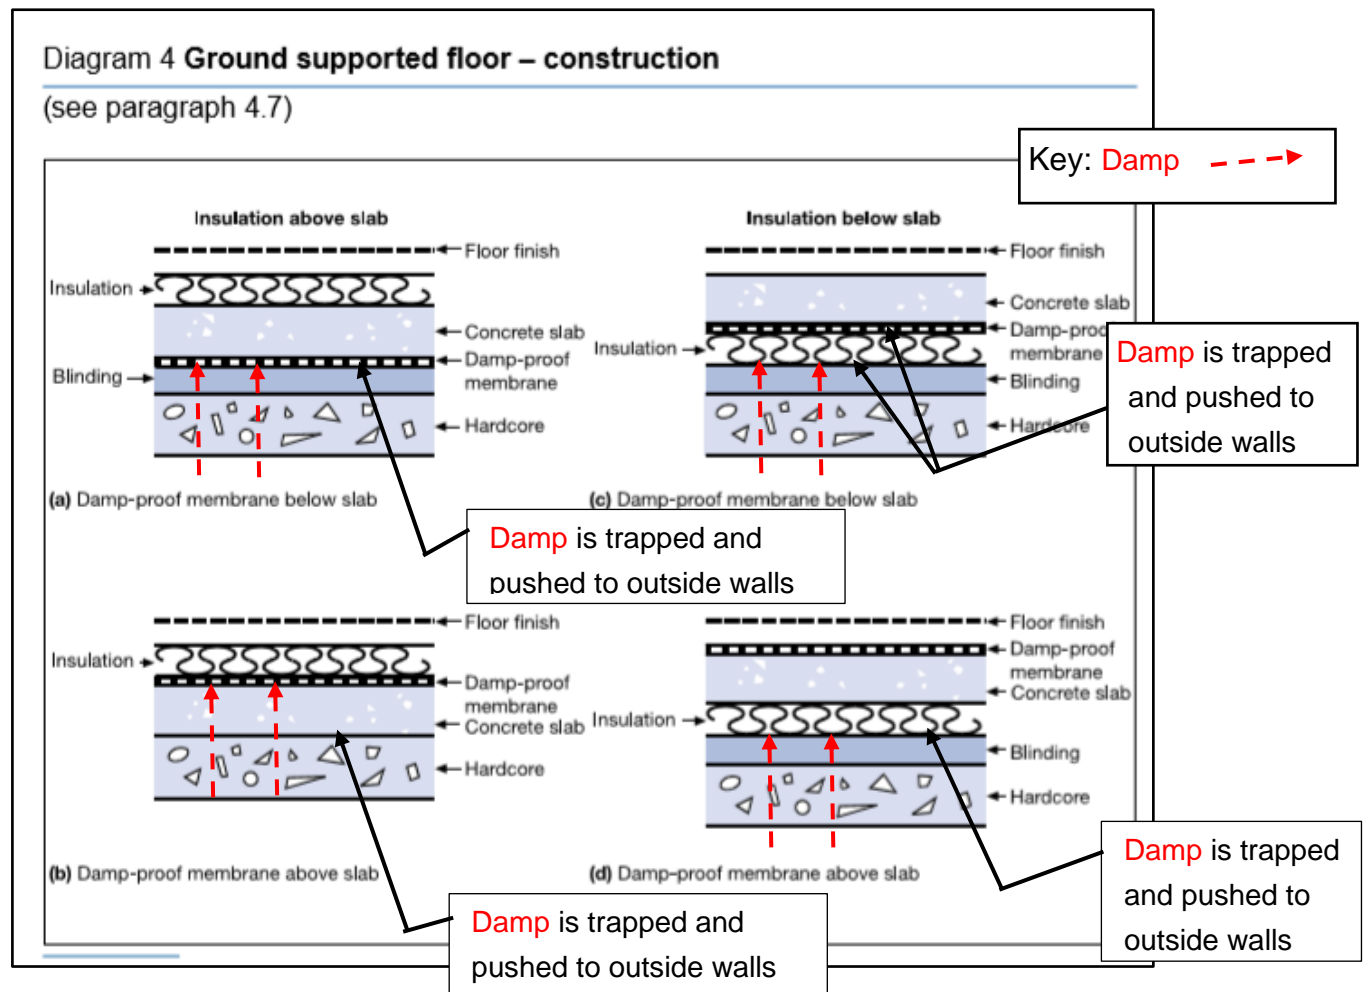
Extract of ground supported floor construction diagrams in Approved Document C and how they trap water
